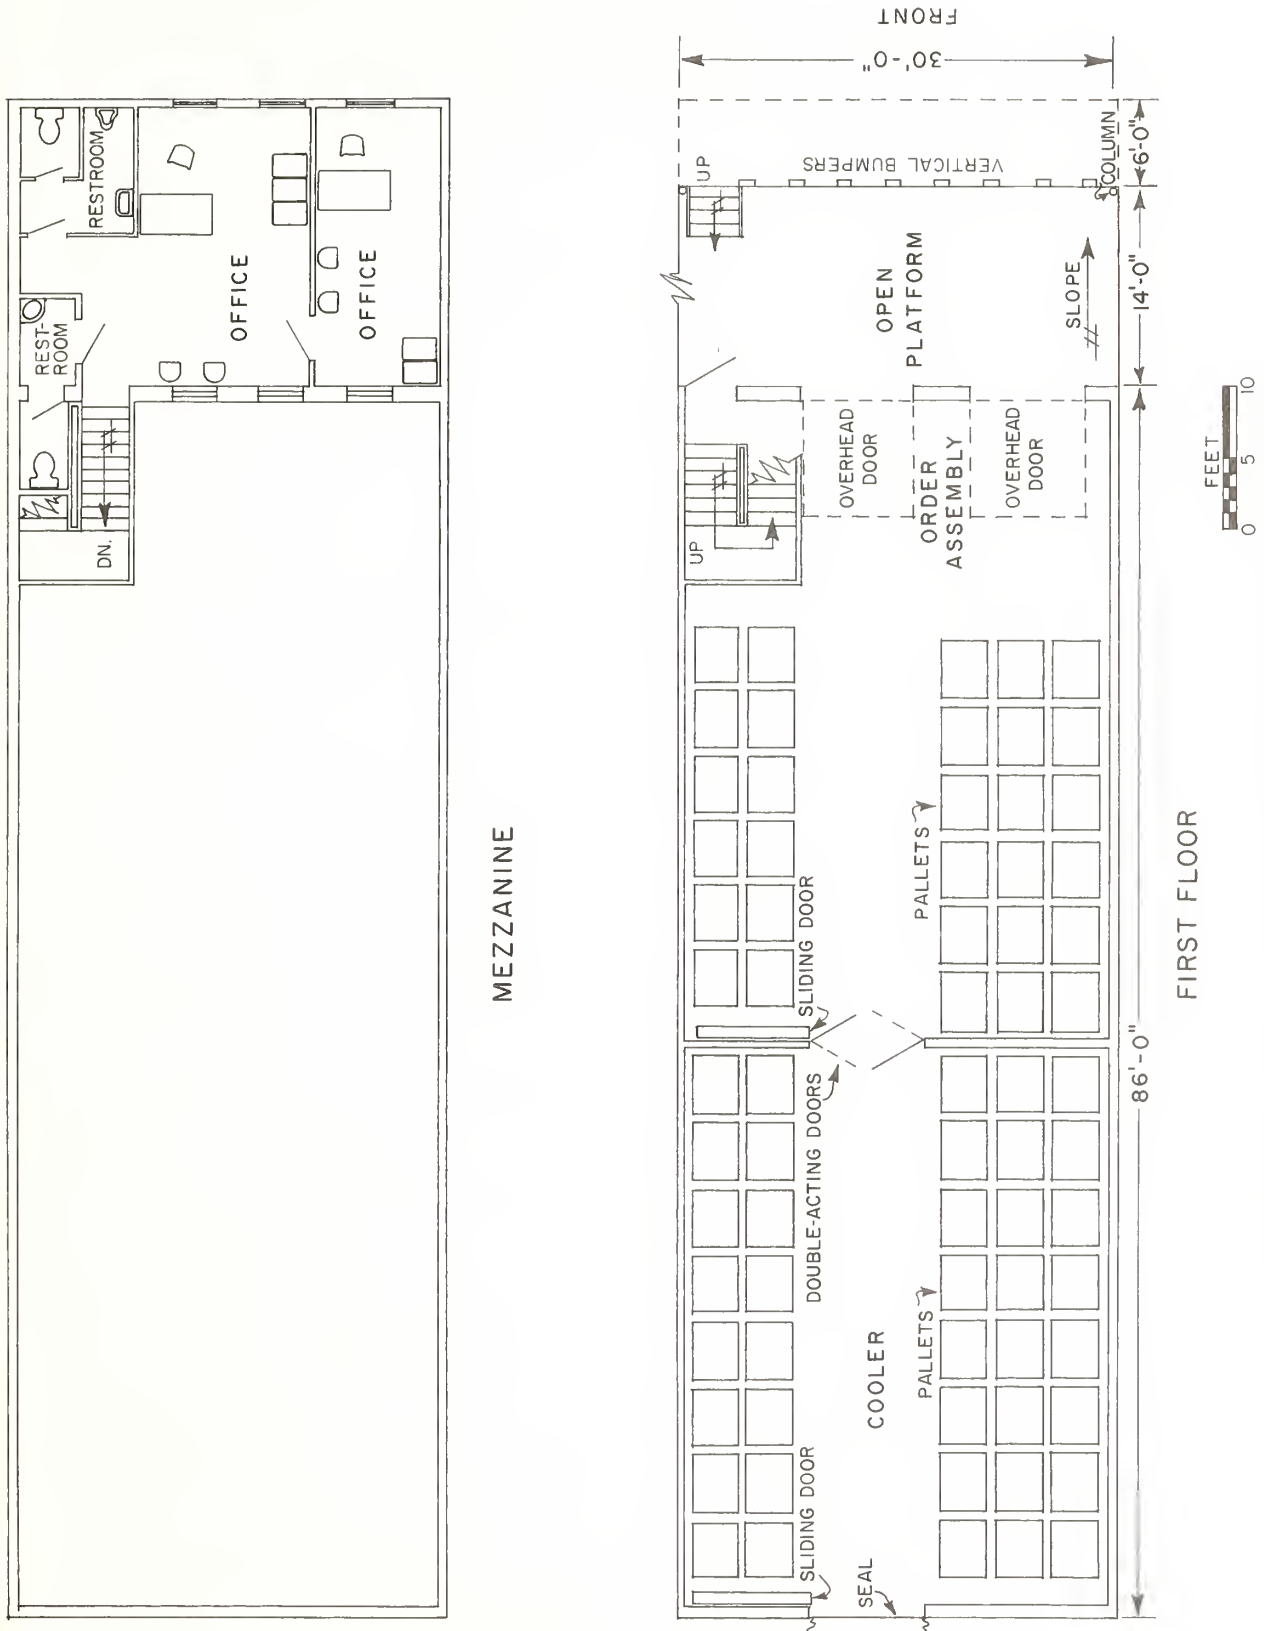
Layout of a fresh fruit and vegetable firm in a multiple-occupancy building unit.
